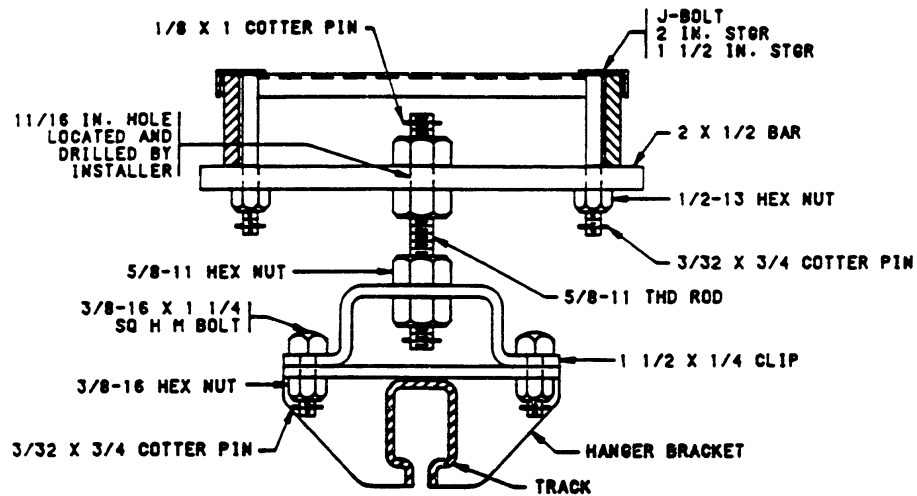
TRACK SUPPORTED WITH EXTENSION ROD AND CABLE RACK MORE THAN 2 FEET 1 INCH IN WIDTH
